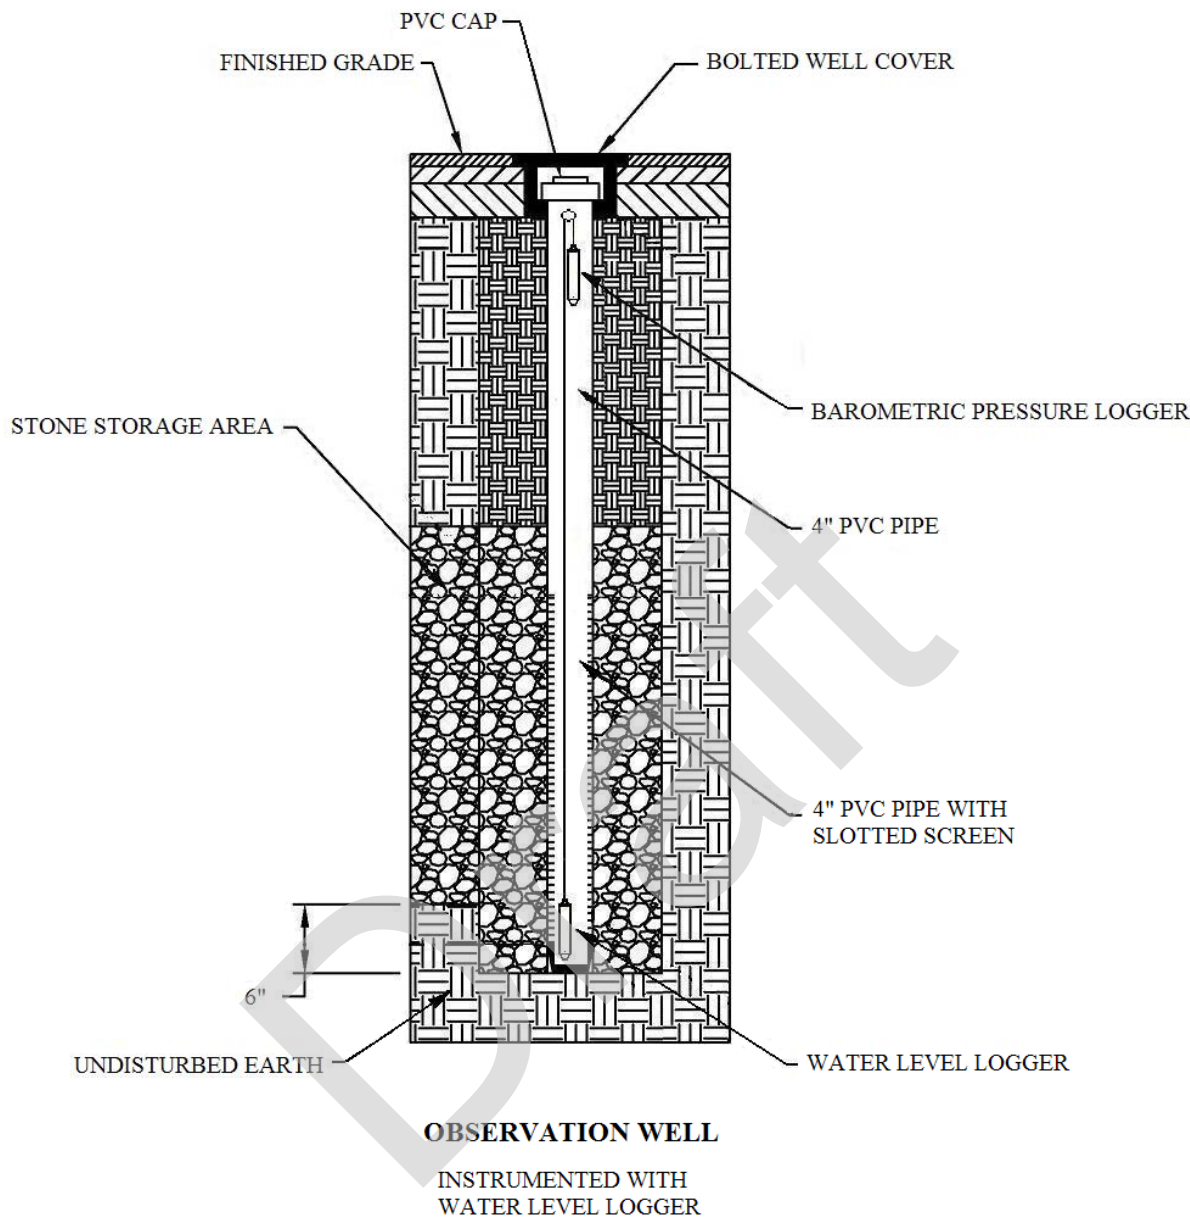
Water level and Barometric Pressure Sensors Installed in Observation Well (typical)
